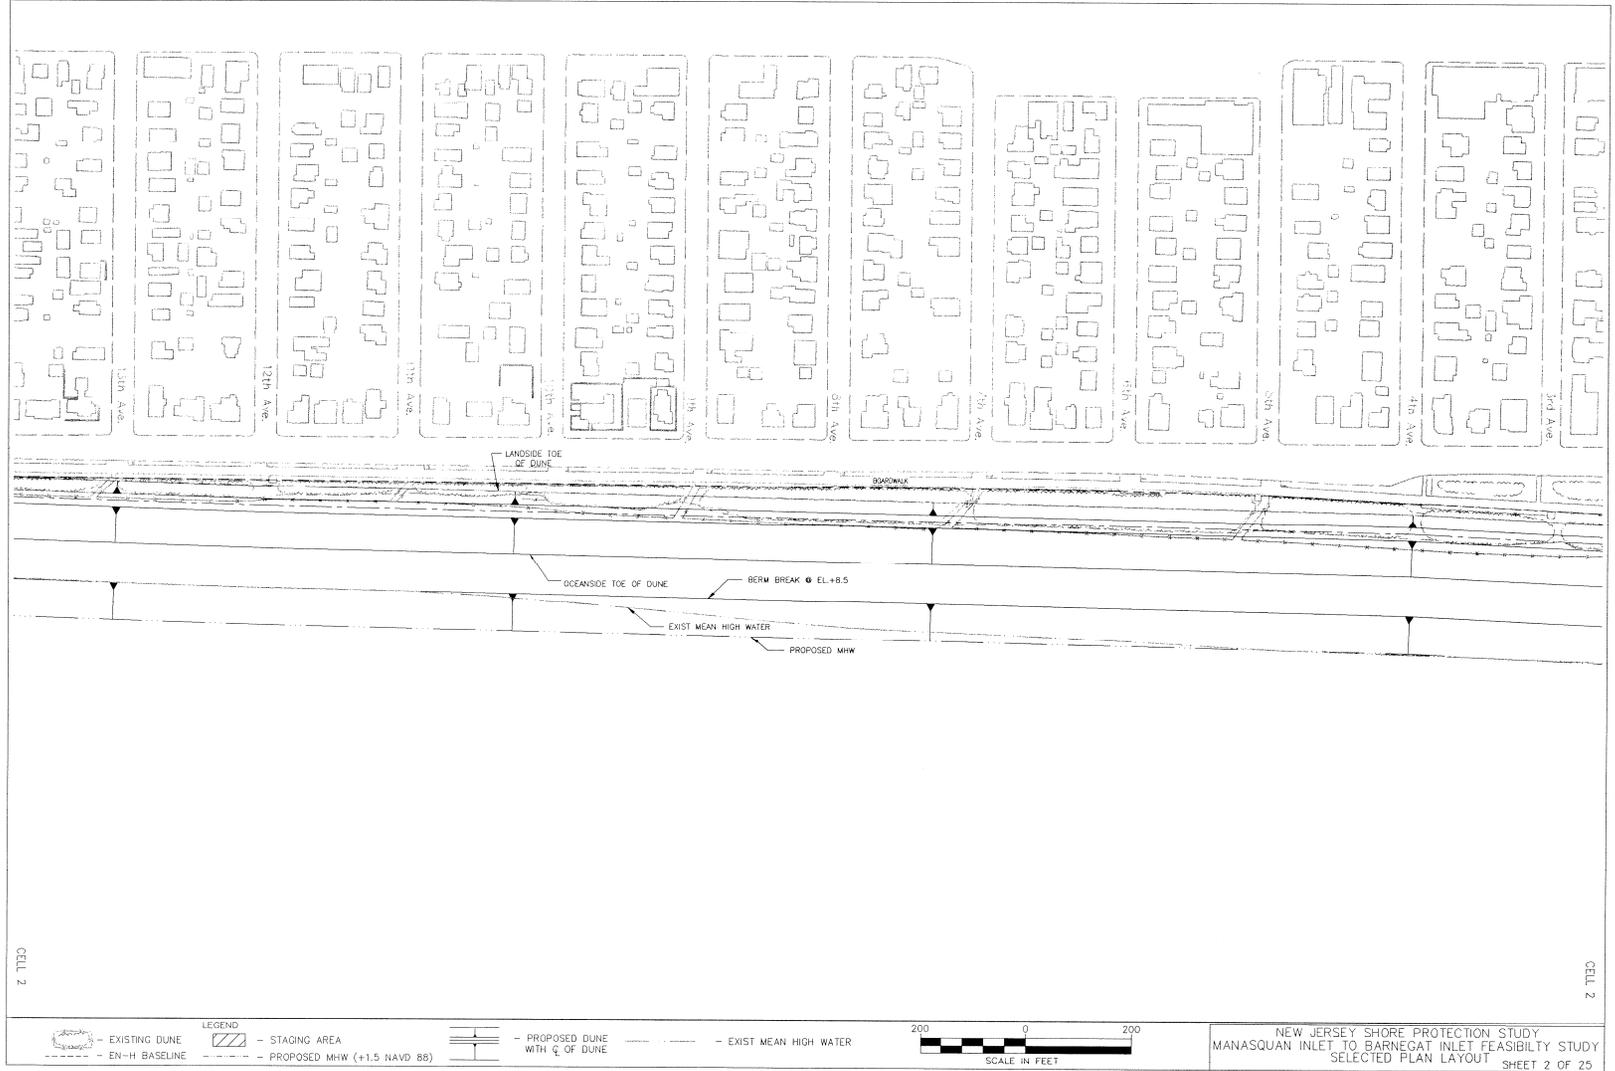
Selected Plan Layout – Seaside Park Borough, 13th Avenue to 3rd Avenue
